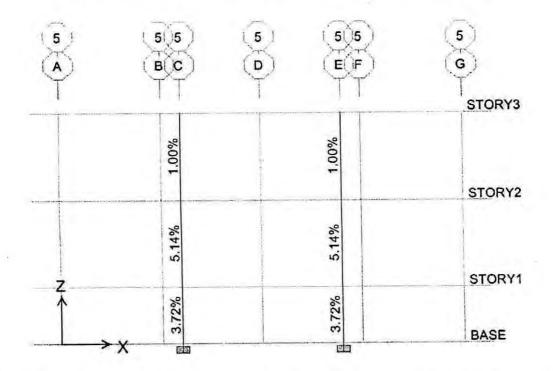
Required rebar percentage of frame members of a typical cyclone shelter funded by Grameen Bank
